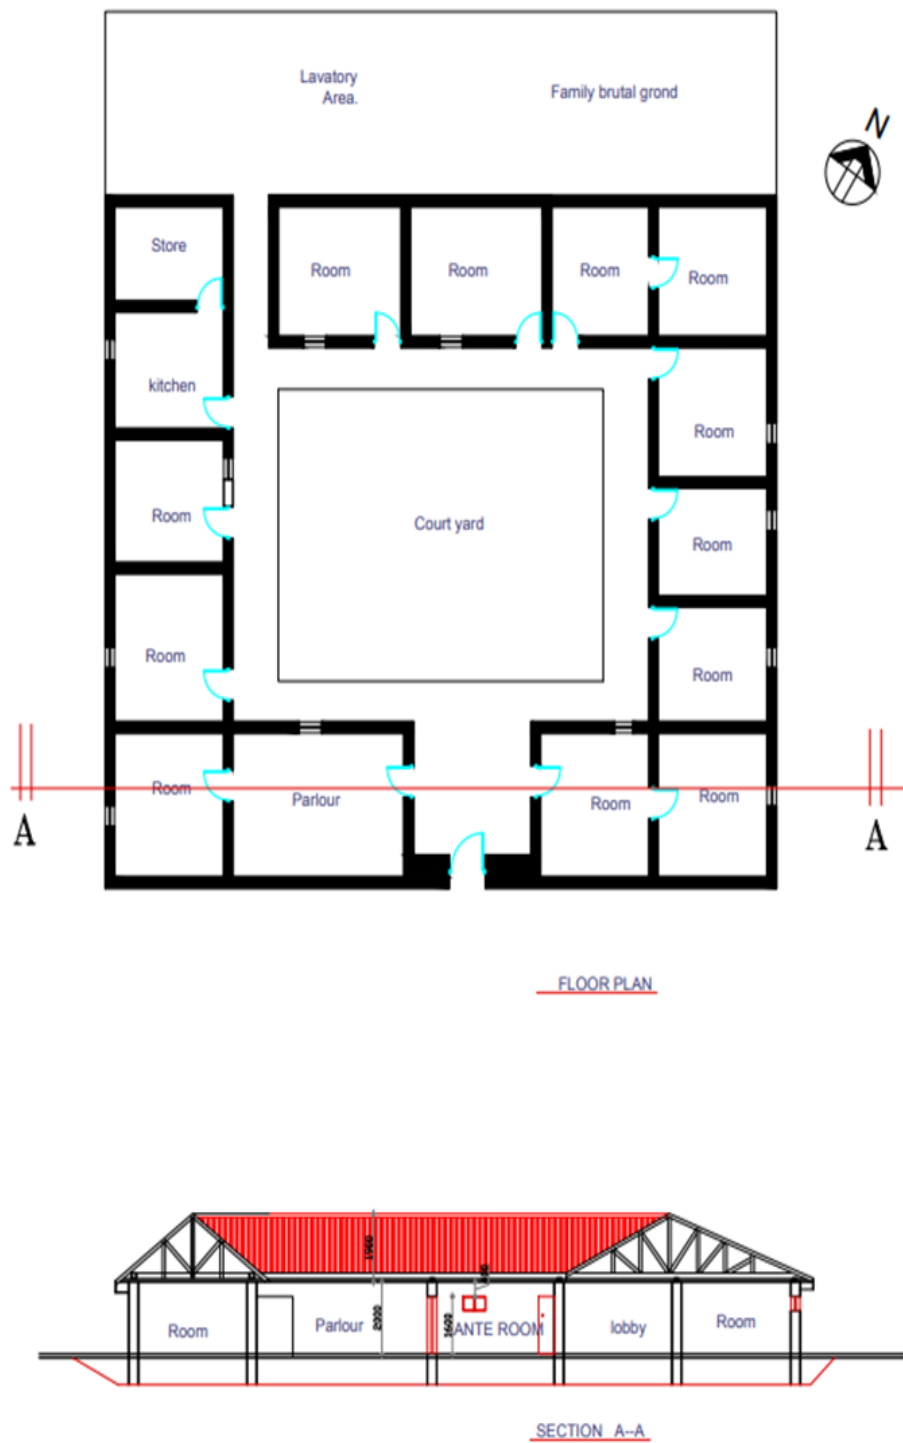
Floor plan and section of Case study building D by AutoCAD 2023
